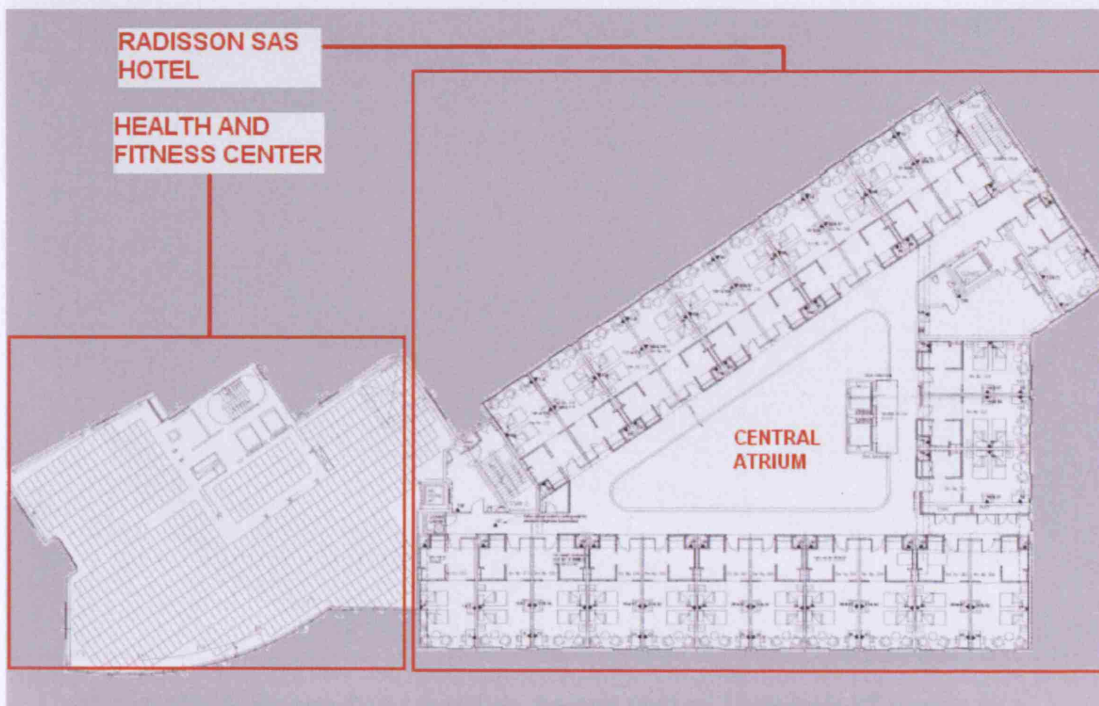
Plan Layout of Building Showing Main Radisson SAS Hotel Property and Adjacent Fitness Centre
